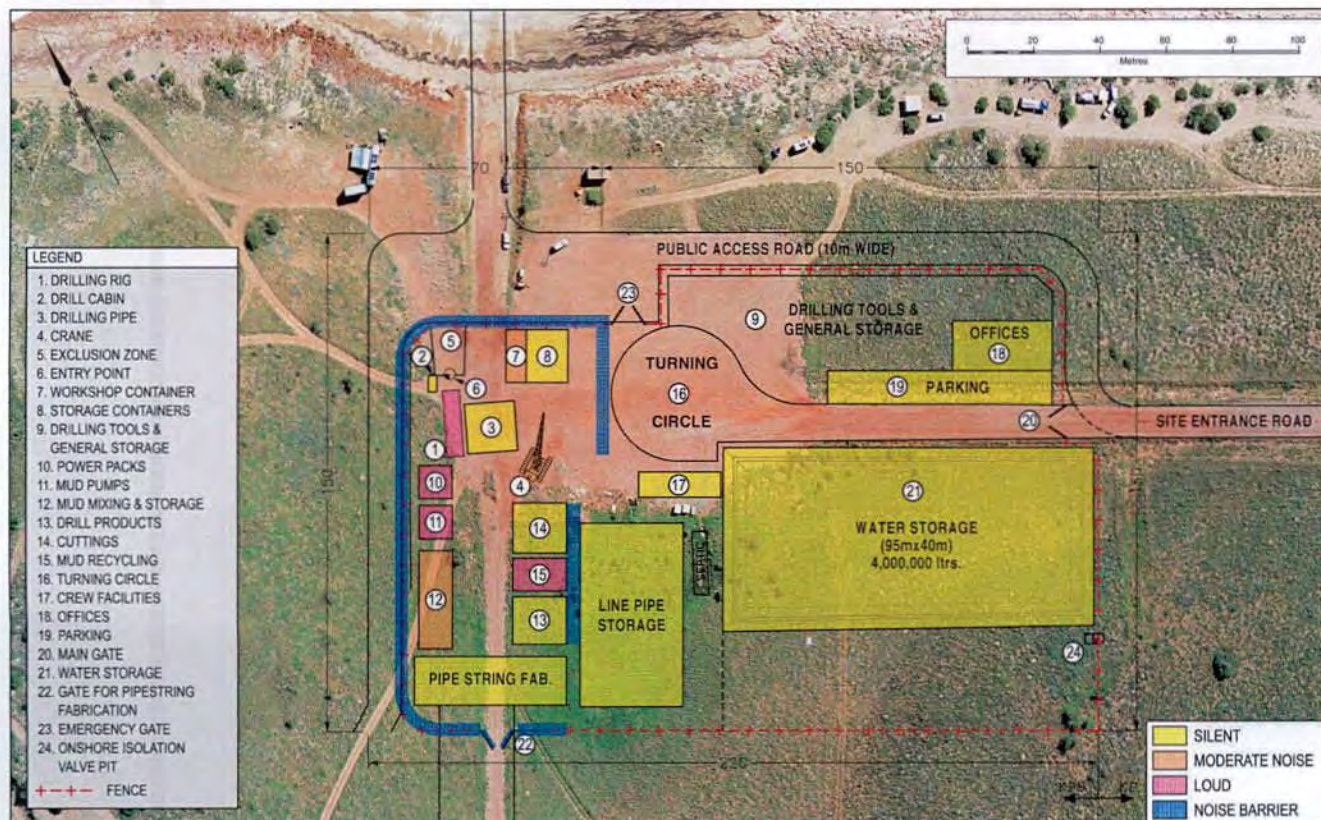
HDD Construction Site Noise Barrier – Option 2.
